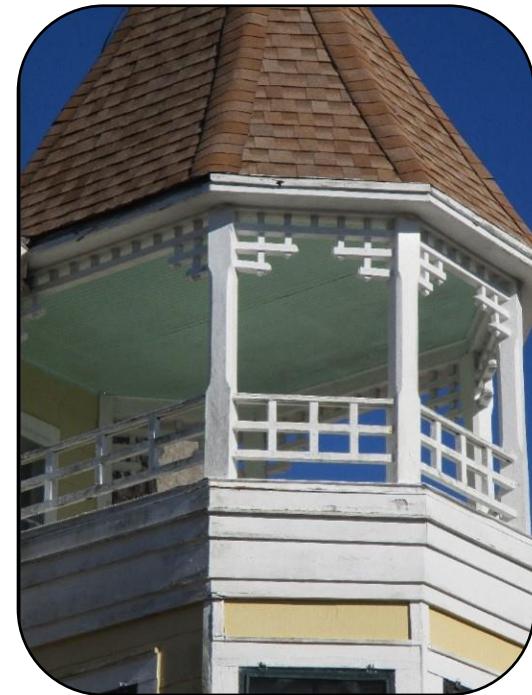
The wood trim on this balcony displays peeling paint and some damaged wood. Architectural features should be preserved rather than replaced.
